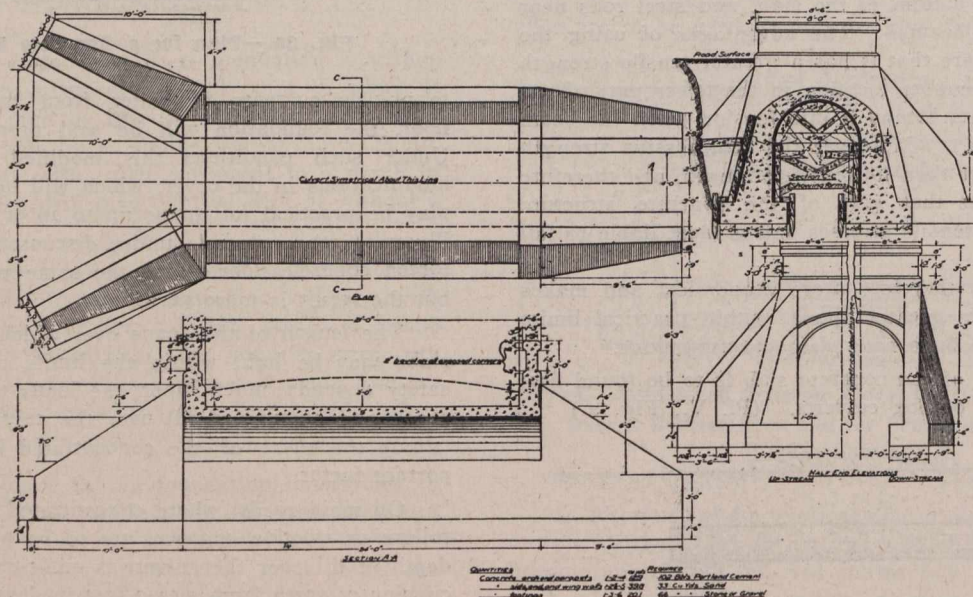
Plan for Plain Concrete Arch Culvert.
